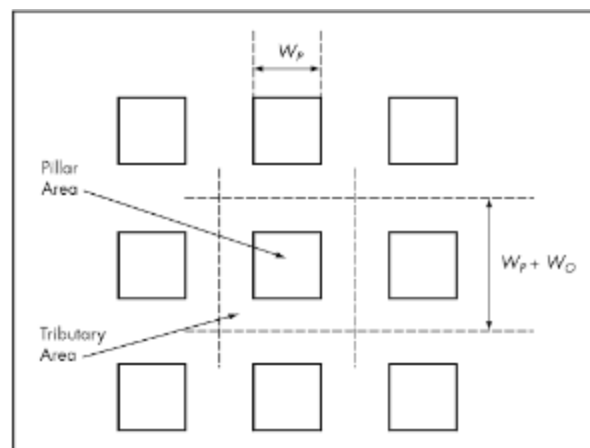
Plan view of a room-and-pillar mine (taken from Darling 2011)
